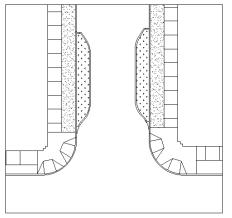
Parking Spaces, Curb Extensions, and Driveways
